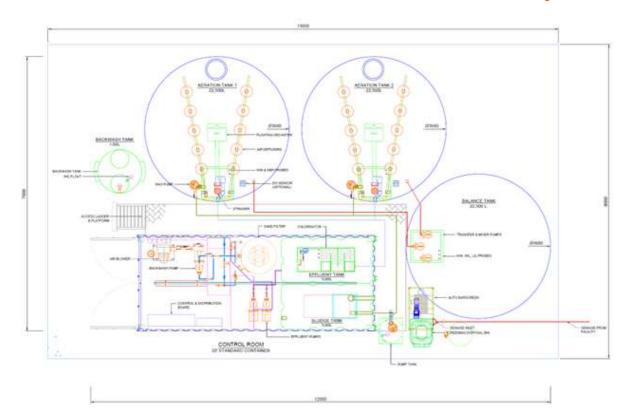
Project Layout - Sewage Treatment Plant Indicative Layout
